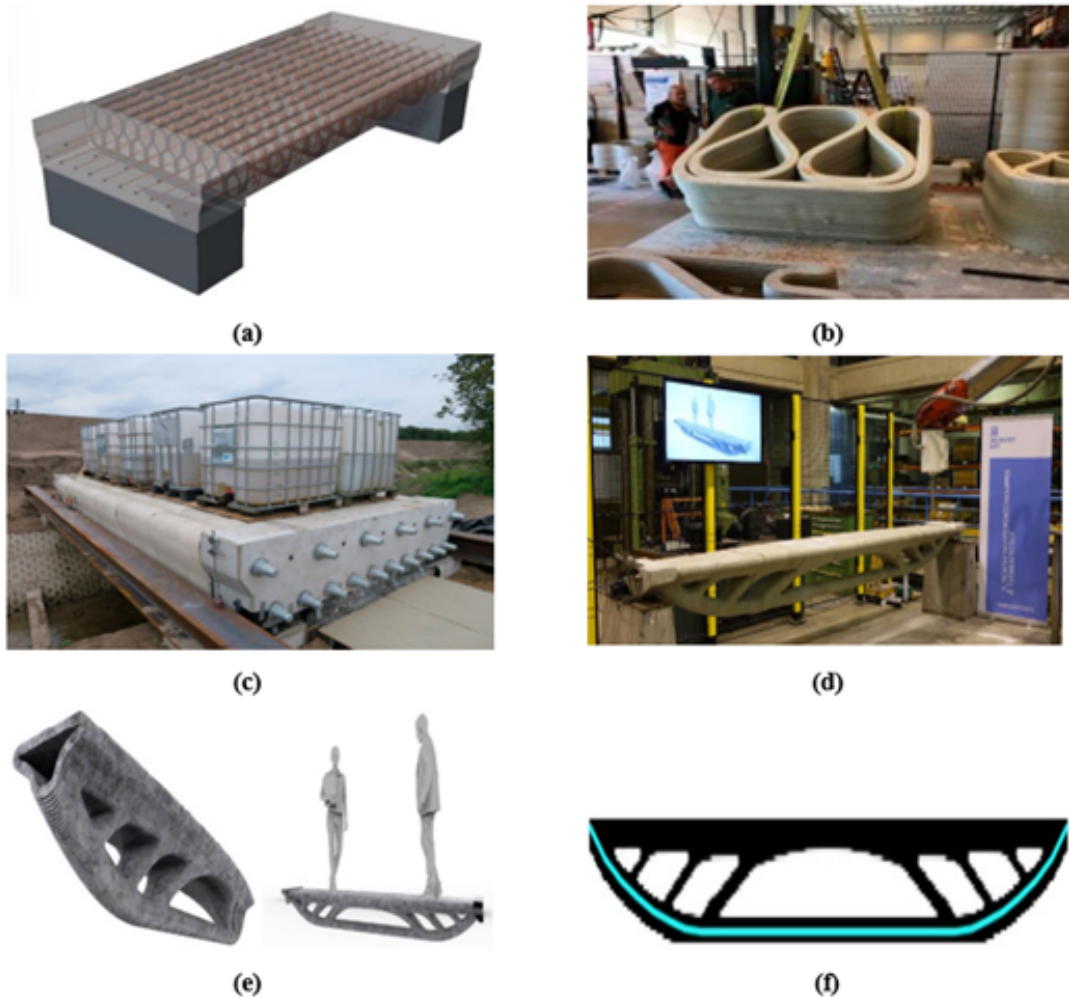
Optimised prototypes of 3DCP structures (a) TU/e Bridge model [80]. (b) prefabricated elements printed in the TU/e printing lab [80]. (c) TU/e Bridge load test on-site [80]. (d) A 3D-printed prestressed concrete girder in Magnel laboratory for concrete research - Ghent University [81]. (e) 3D modelling of the girder [81]. (f) Topology optimisation of the girder by Technion - Israel Institute of Technology [81].
